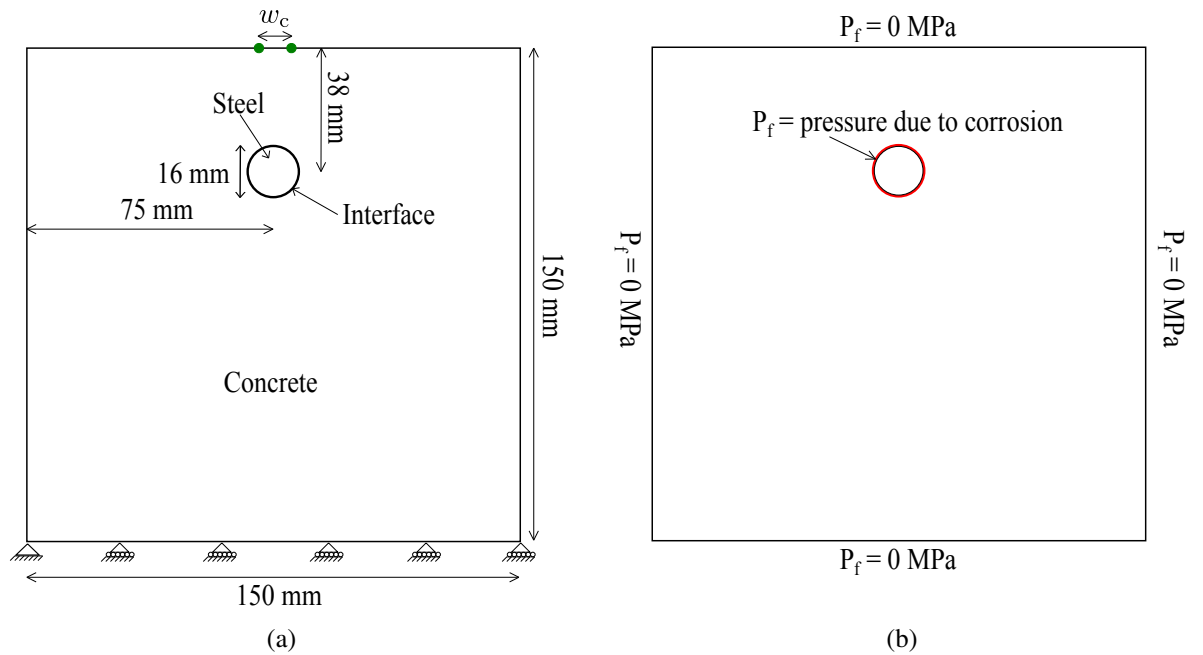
Concrete specimen containing a single reinforcing bar: (a) geometry (Andrade et al., 1993) and (b) boundary conditions.
